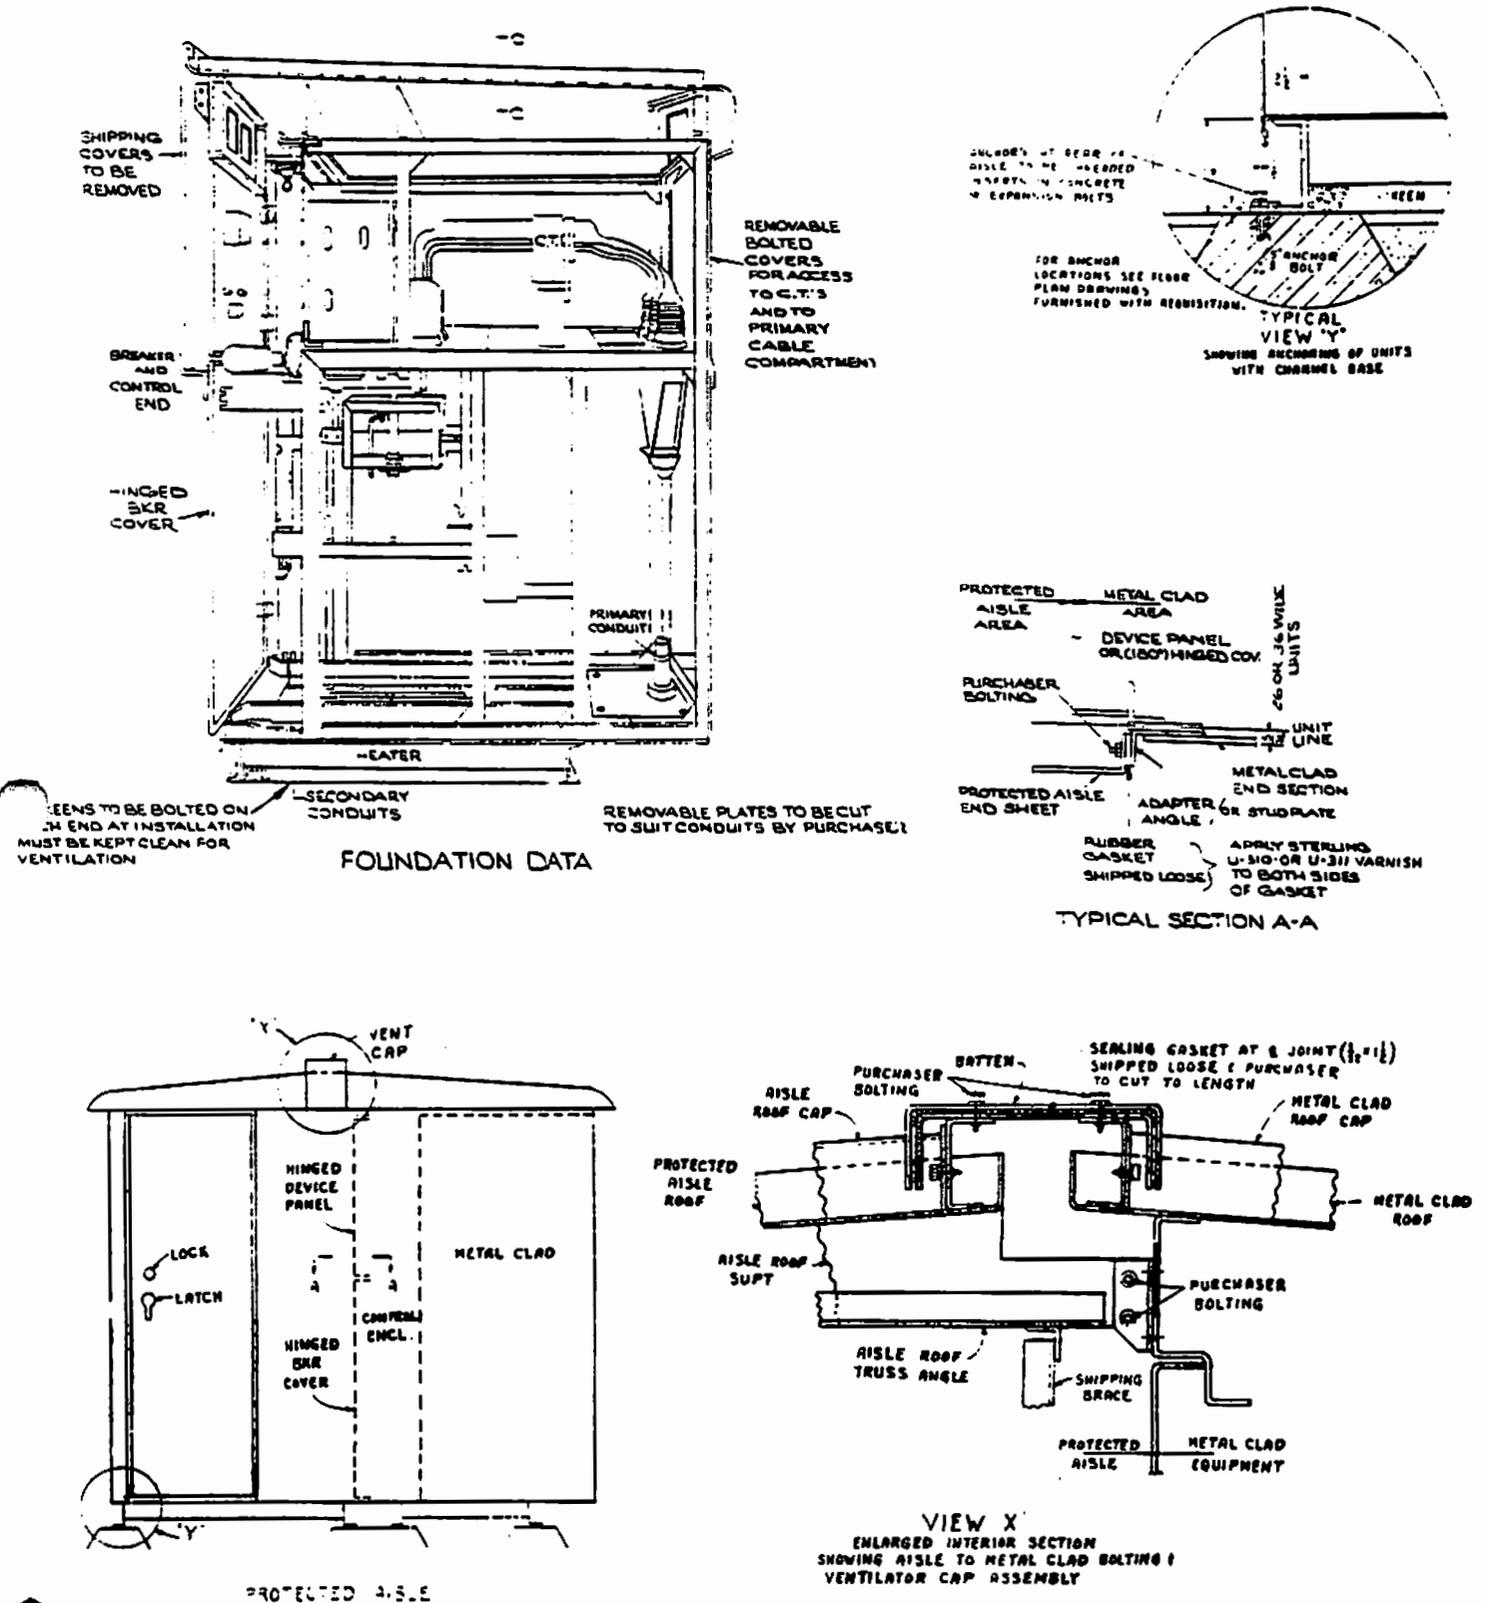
(118RD727) INSTALLATION DETAILS FOR OUTDOOR METAL-CLAD SWITCHGEAR WITH PROTECTED AISLE
